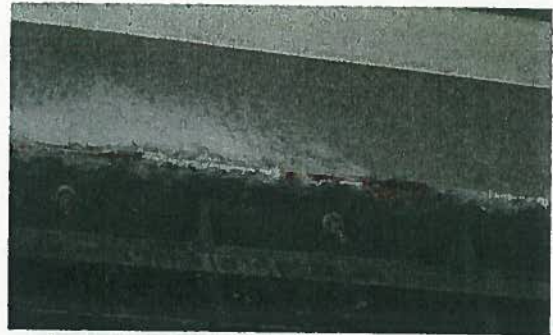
Hopper Anchors In Residuals Handling and Dewatering Facility
